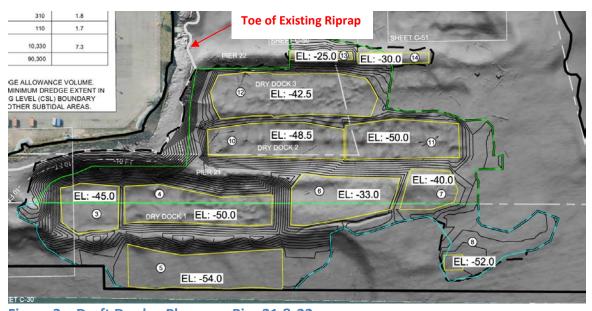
Draft Dredge Plan near Pier 21 & 22
